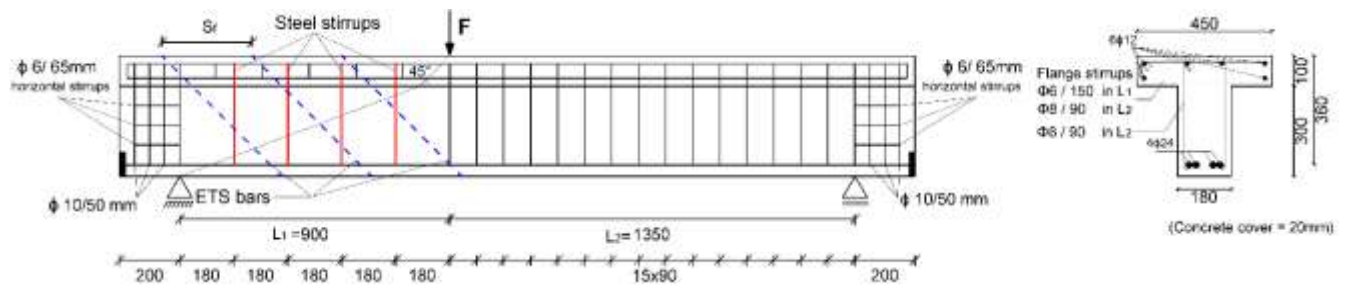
Tested beams: geometry, steel reinforcements applied in all beams. Beam 4S-S300-45 is presented: stirrups spaced at 180 mm and inclined ETS bars spaced at 300mm (all dimensions in mm).
